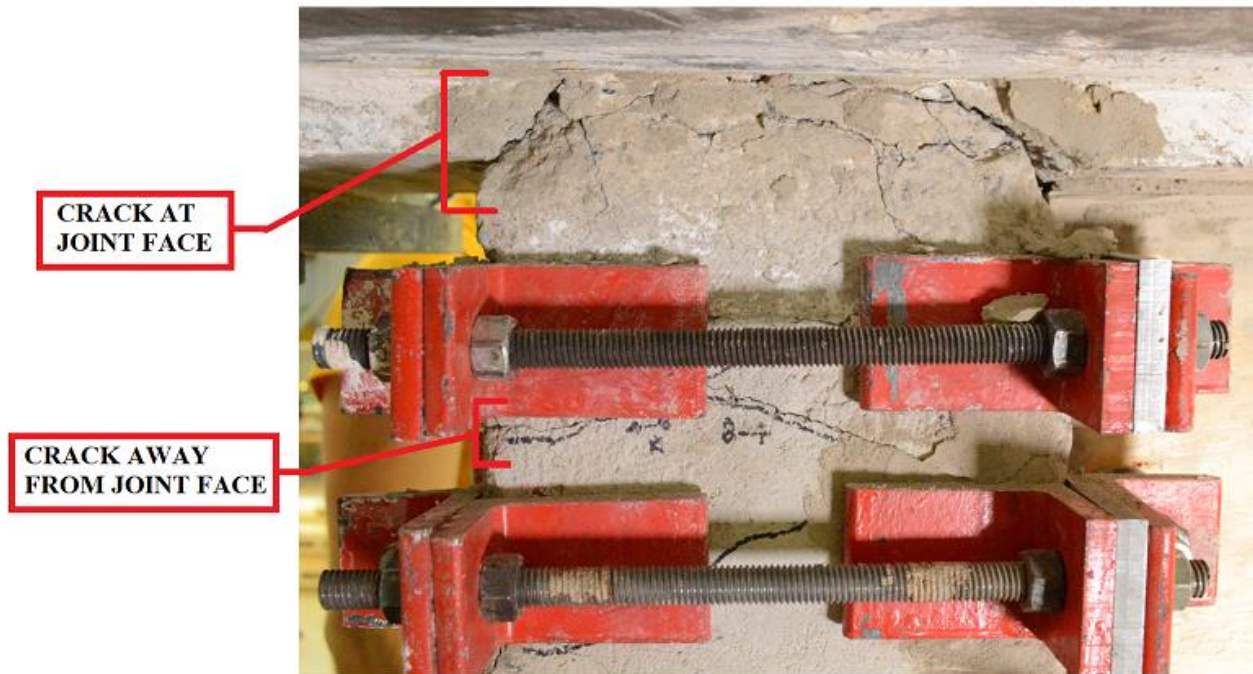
Crack Formation at Column Top after Run 105 of Frame 2,
